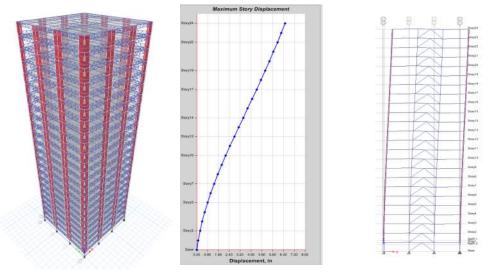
Case 3, 24-story braced frame with steel plate at columns and x-rod braced structural cladding. 3-D view of ETABS model, wind drift graph and elevation diagram showing deflection under wind load. (HOK).
